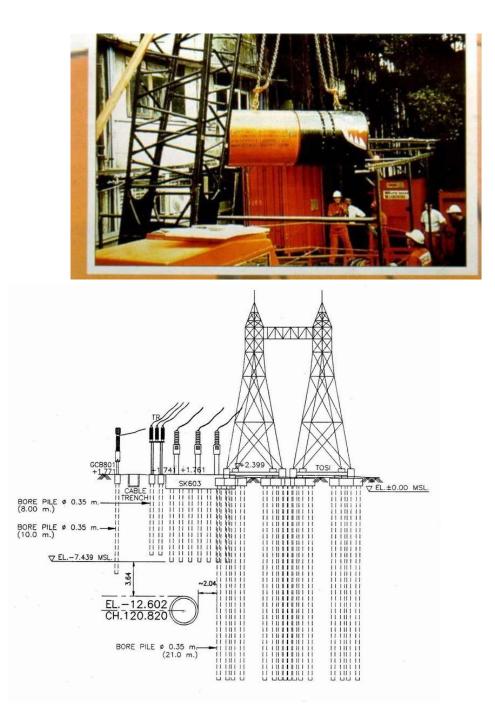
Some tunneling activities and challenging situation in Bangkok
